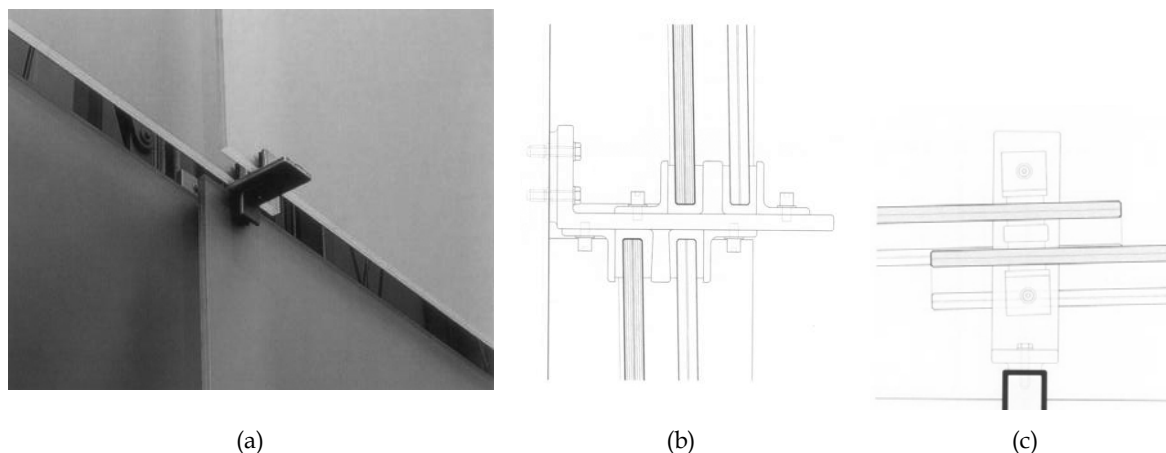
Close view (a), vertical section detail (b), and horizontal section detail (c) of the Kunsthhaus Bregenz facade connection system.
